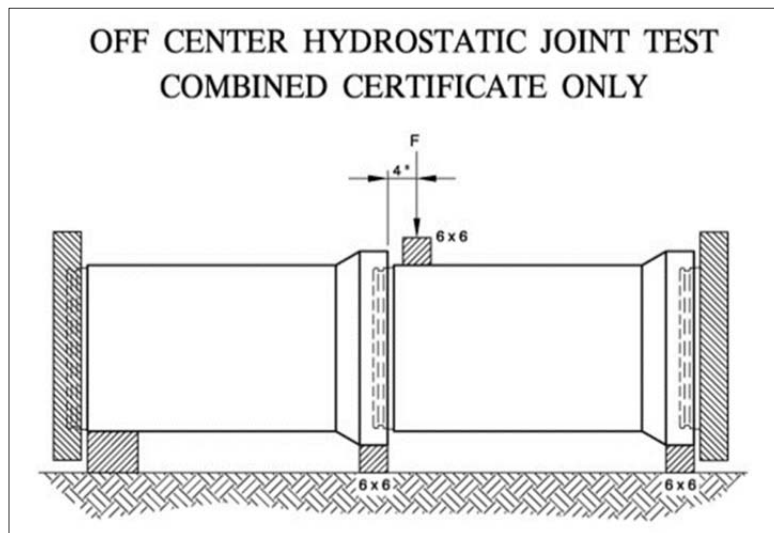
Illustration of Off Center Hydrostatic Joint Test Setup.
